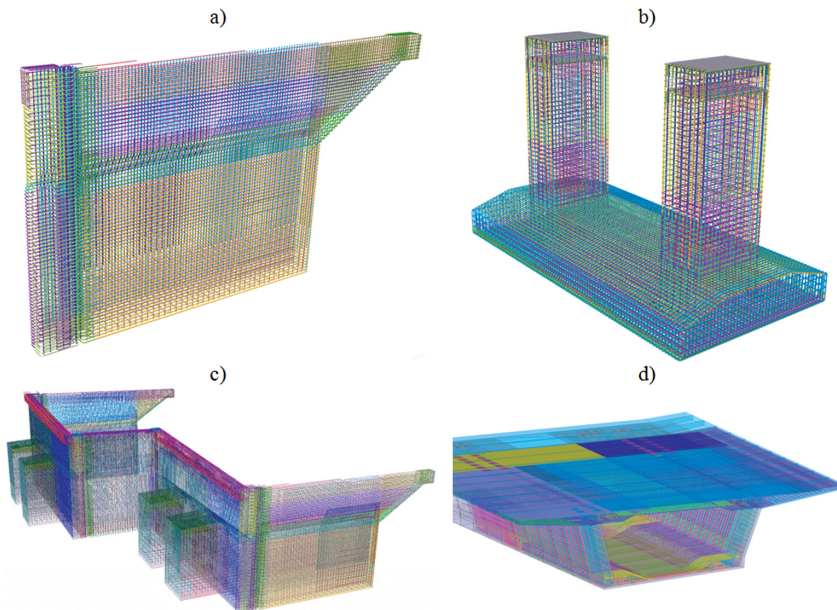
Examples of modelled reinforcement and prestressing drawings: a) reinforcement of the wing of the abutment P11; b) reinforcement of the foundation footing and pillars; c) reinforcement of the abutment P11; d) reinforcement and prestressing of the superstructure of the left roadway
